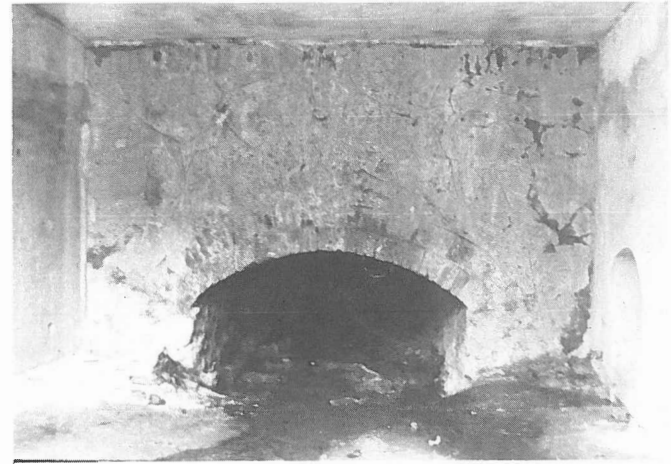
Access to the 1903 railroad culvert. This was the inlet of the Ancones railroad culvert. Today it is the first segment of the tunnel. It corresponds to the widening of the railway road-bed which was required to accommodate the passenger station in this area. The completion of the Yauco-Hormigueros line finally took place in 1904 after an interruption that began in 1892 due to lack of capital.
